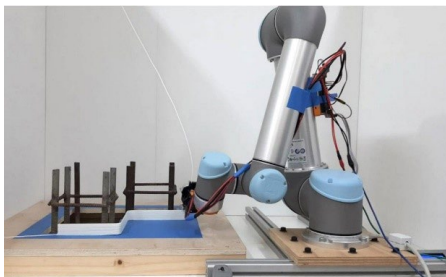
Perimeter printing proofs of a reinforced structural element. Source (Authors 2020).
